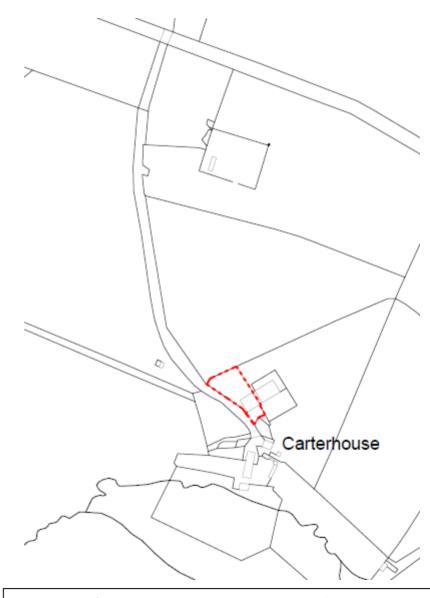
Extract from STE21S-02-01-109 Site Location Plan (Source: CB3 Design Architects).
